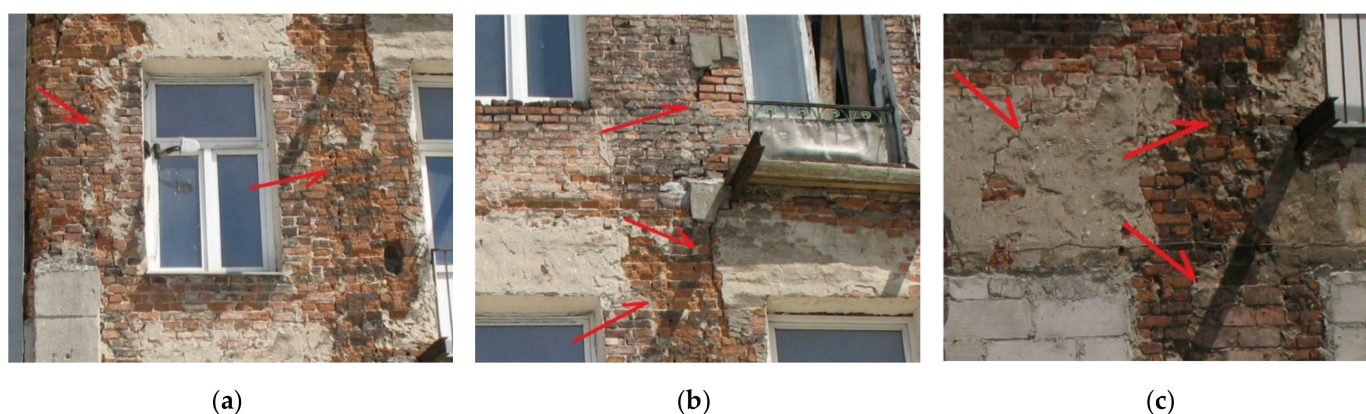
The collapsed area before commencement of the works: (a) wall on the second floor, (b) structural slab above one floor, (c) structural slab above the ground floor.
